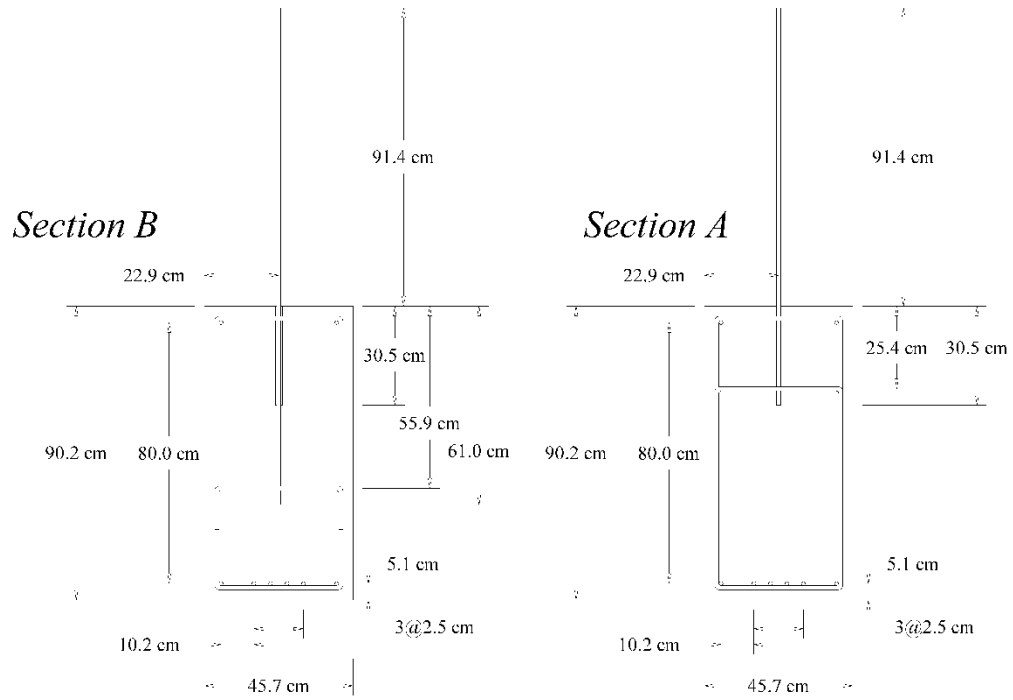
Reinforcement in a cross section of the rectangular beams. Sections A and B refer to the installment of the prestress strands for pull-out tests.
